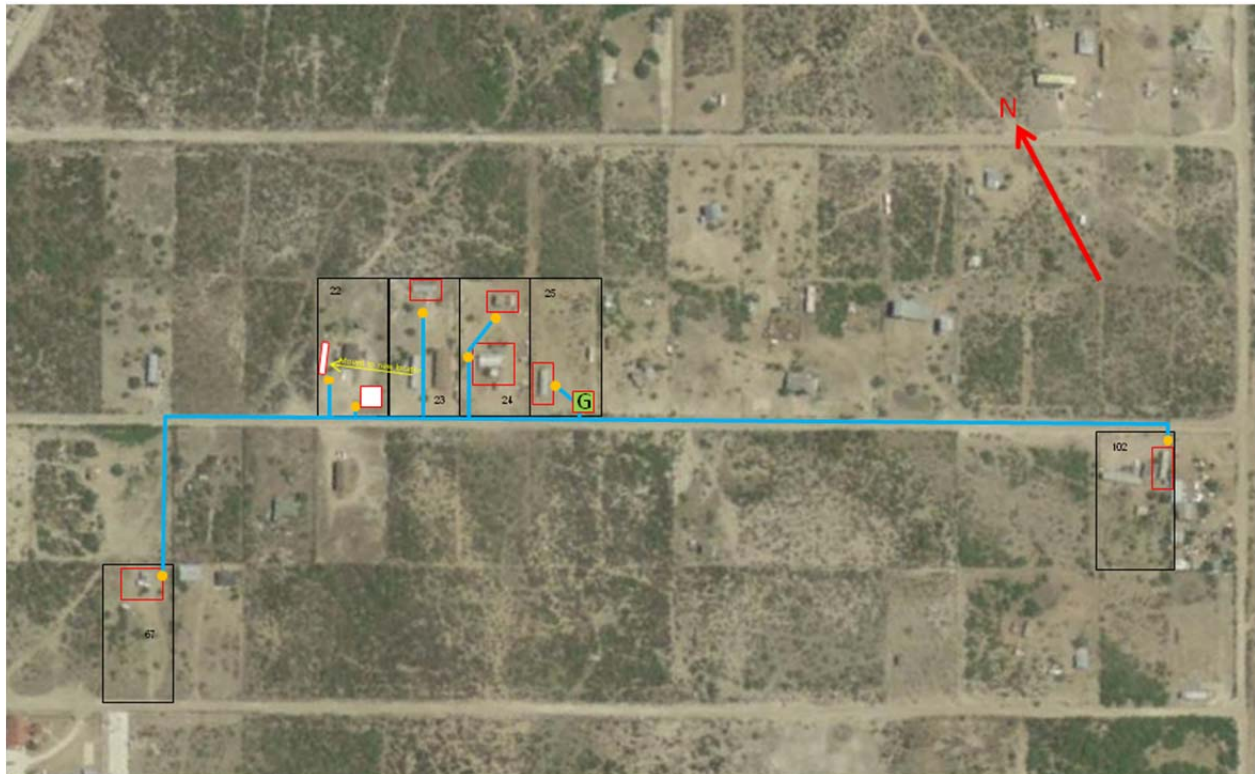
Aerial View of Los Nopalitos Proposed Site Layout
